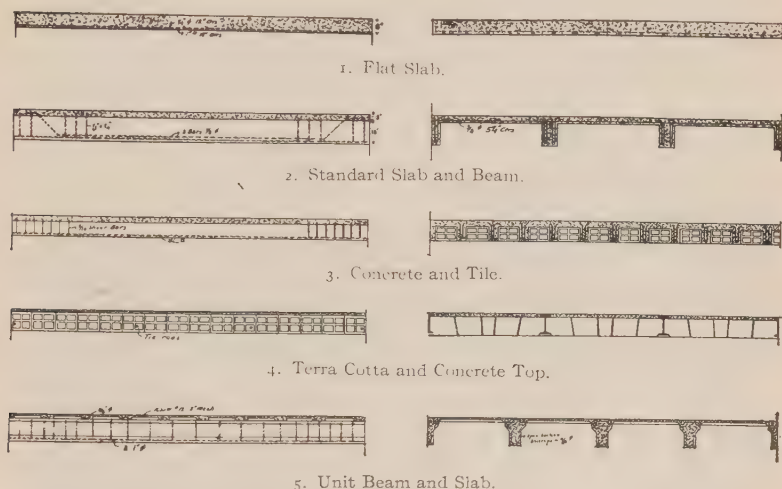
TYPES OF FLOOR CONSTRUCTION COMPARED IN TABLE III.
